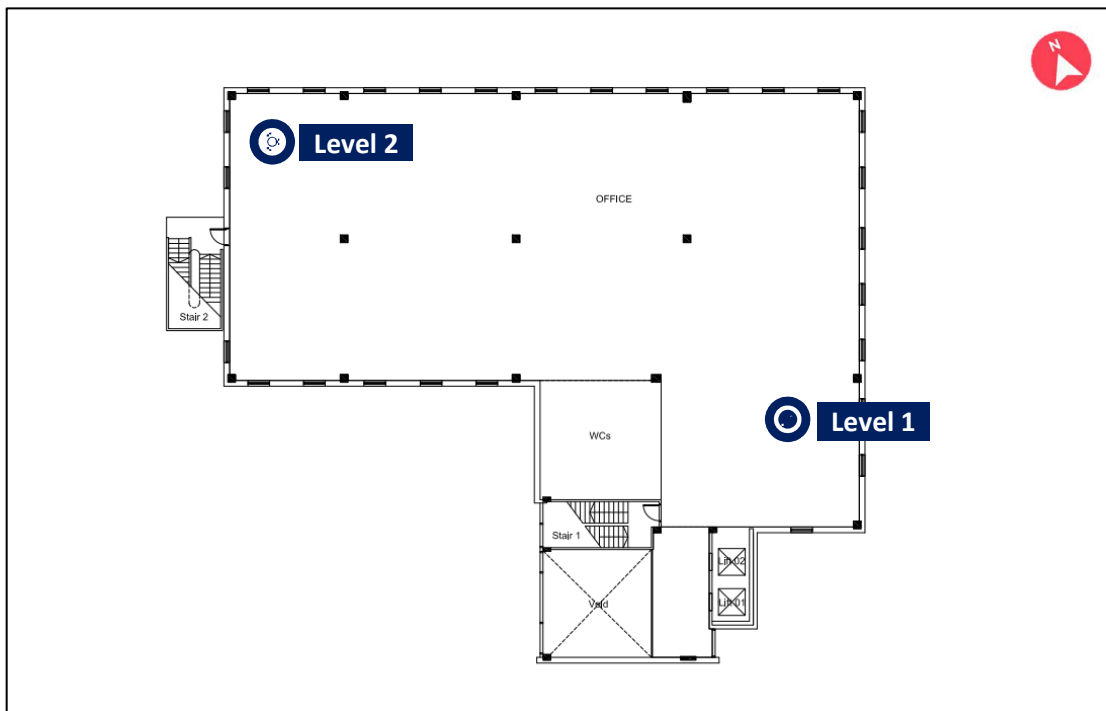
Typical floor plan presenting internal measurement positions (Image courtesy of Orbit Architects)
